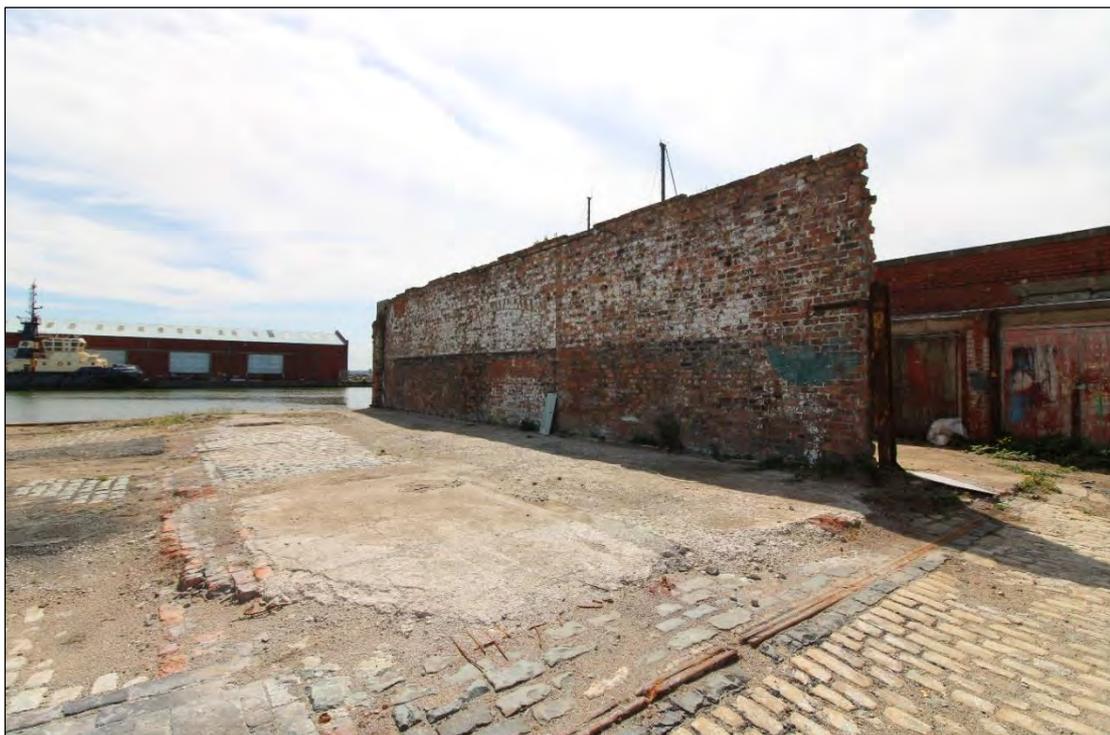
Upstanding linear brick wall to the east of the Maintenance Shed, facing south-west
